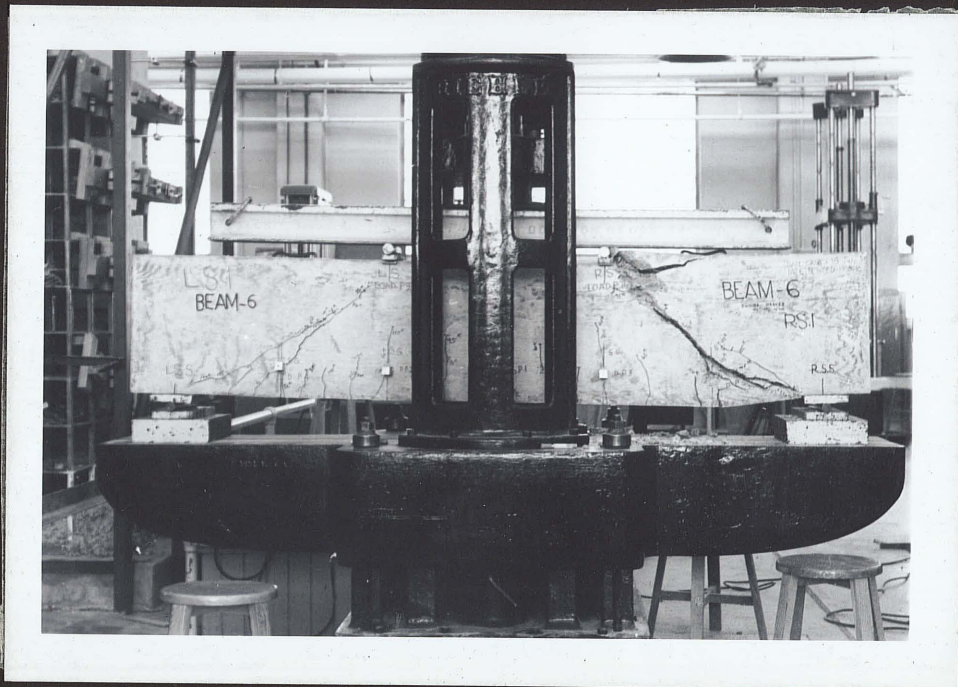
Failure of Beam 6: Details and Crack Pattern
